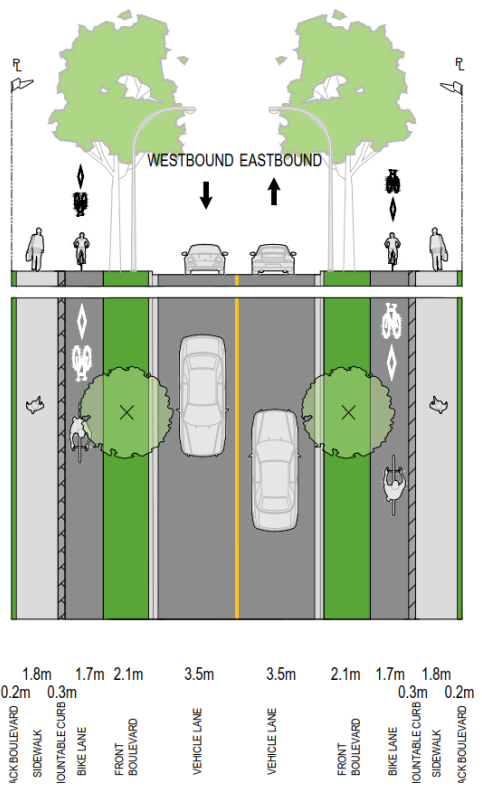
Thrift Avenue Proposed Illustrative Cross-Sections
